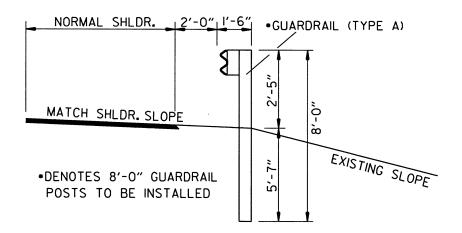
DETAIL FOR COUNTY ROAD TURNOUTS OPEN SHOULDER SECTION
